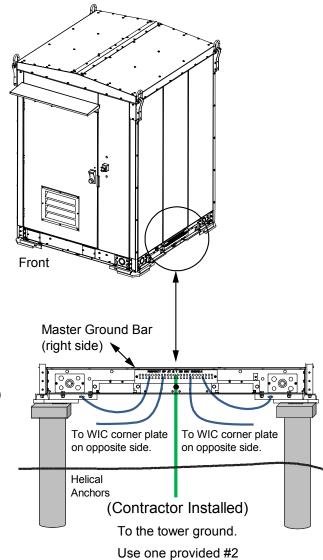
XTE 802G Site Grounding Scheme (Helical Foundation)
